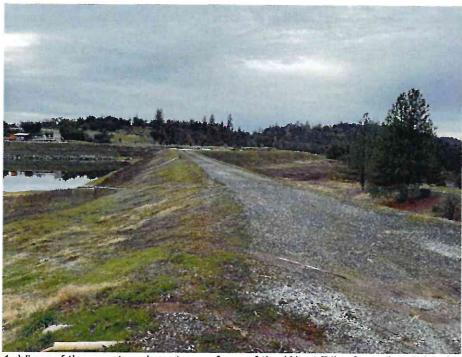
View of the crest and upstream face of the West Dike from the right abutment.
